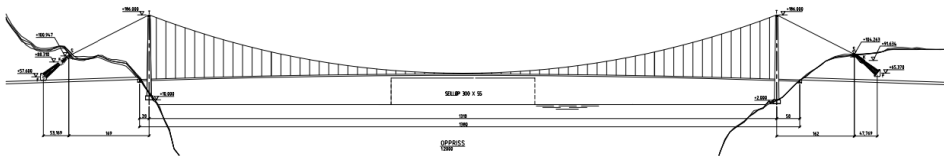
Front elevation of the Hardanger Bridge. [1]
